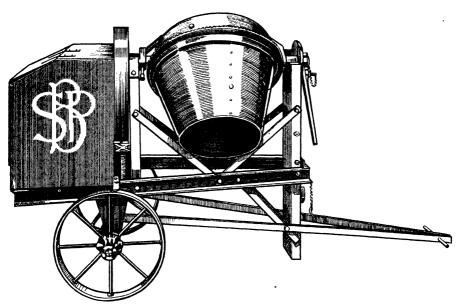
A SMALL PETROL-DRIVEN CONCRETE MIXER
